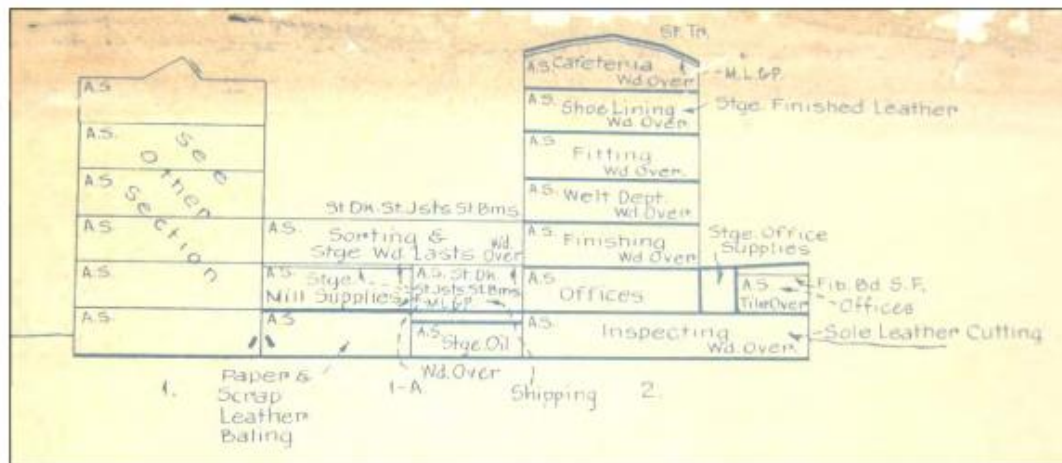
Section through building looking south showing cafeteria/recreation hall on 6th floor (1953).
